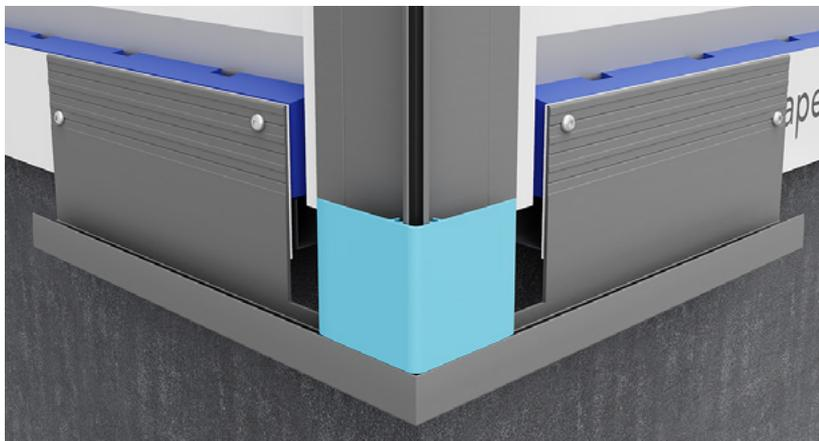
DUMMY SECTION CAP FLASHING ALIGNMENT
